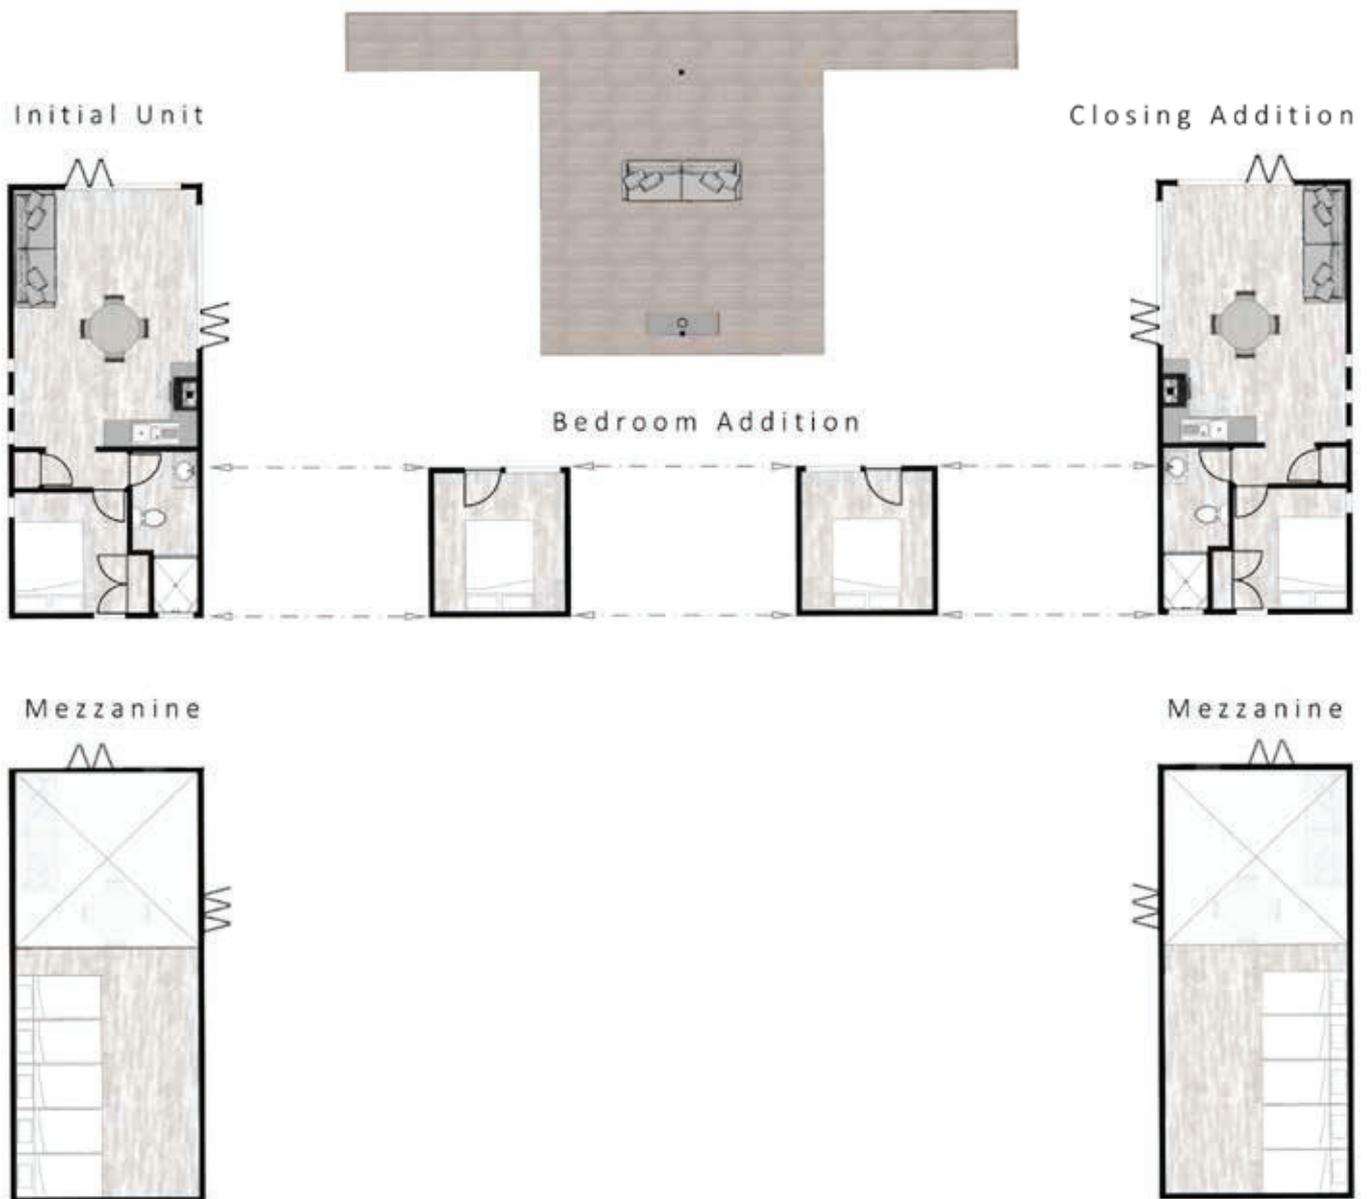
Whare Kāhui Floor Plans showing potential for staged development
